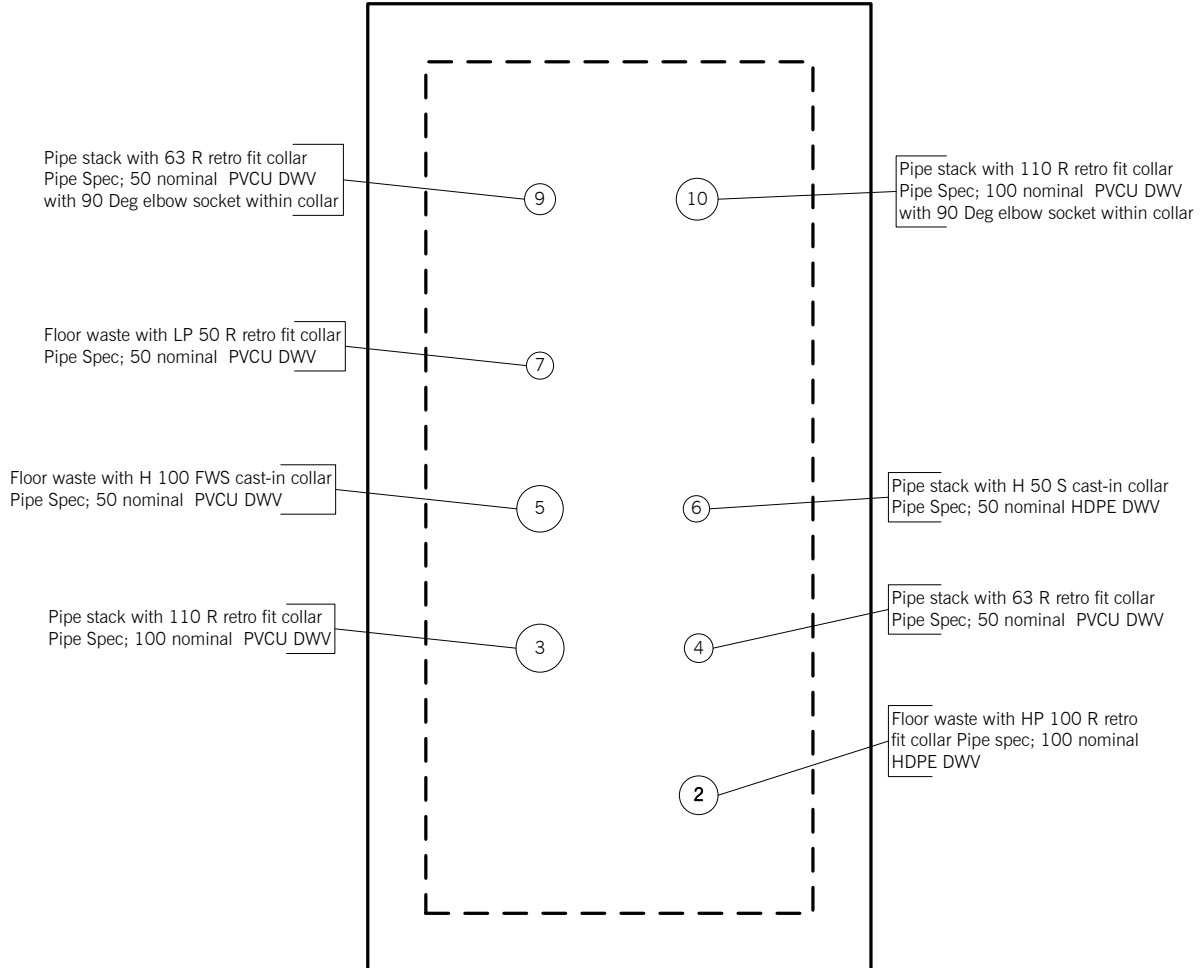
Specimen 2. Floor waste with HP 100 R Collar
